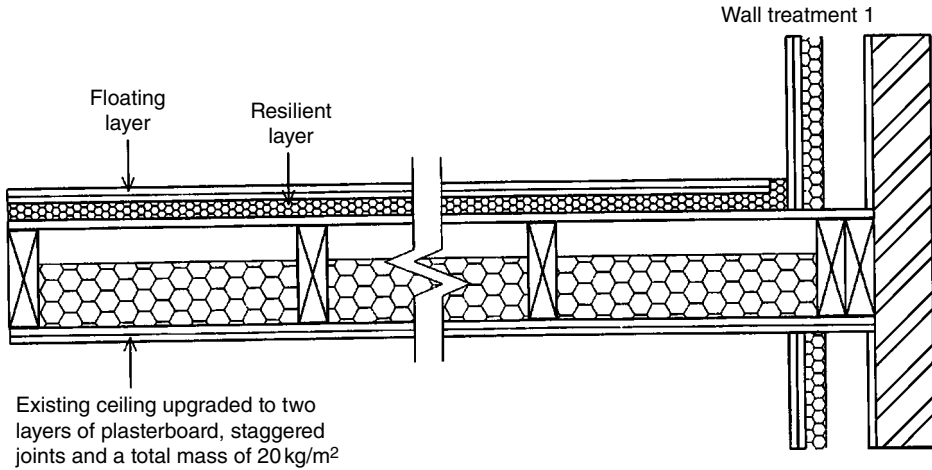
Construction details of Floor Treatment 2 showing junction with Wall Treatment 1.
